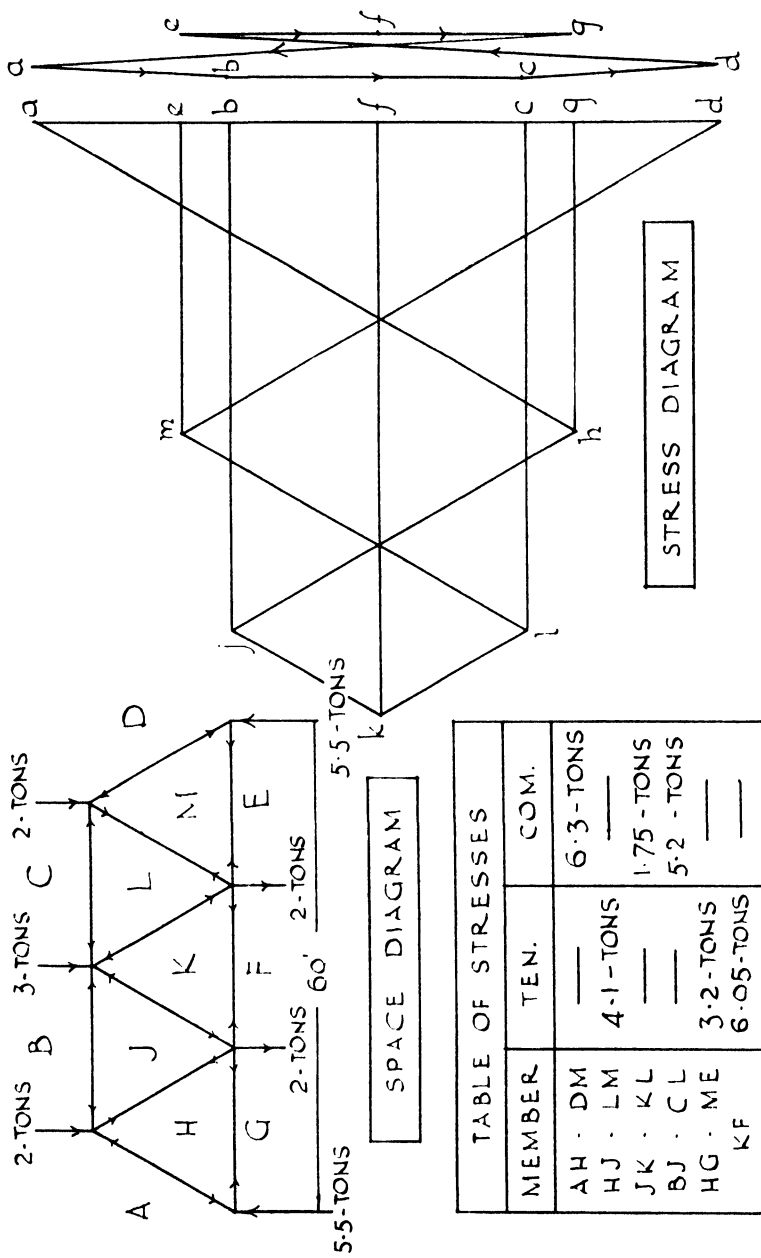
Framed Girder with Top and Bottom Loads—Stress Diagram.
